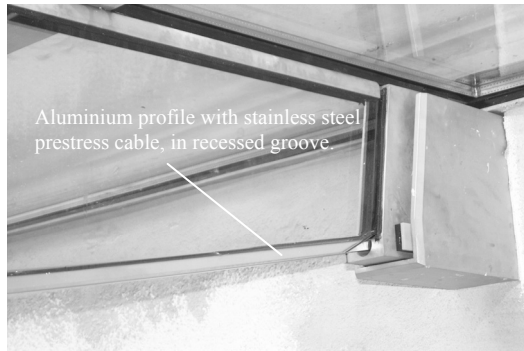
Glass beam (detail) at the Spa Thermen in Badenweiler.
